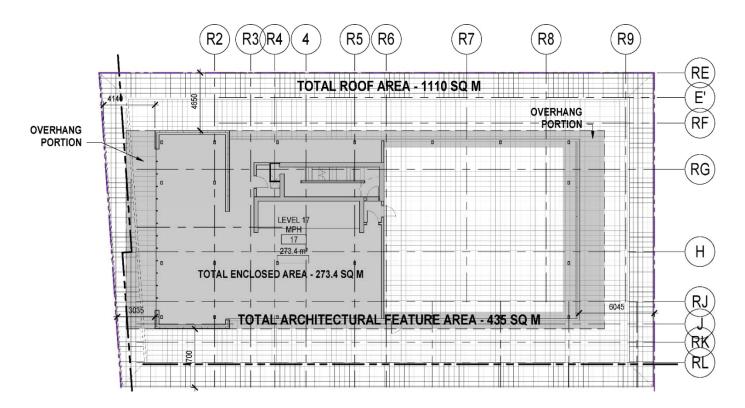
shows the total roof area on level 17 and the total area of the architectural feature
